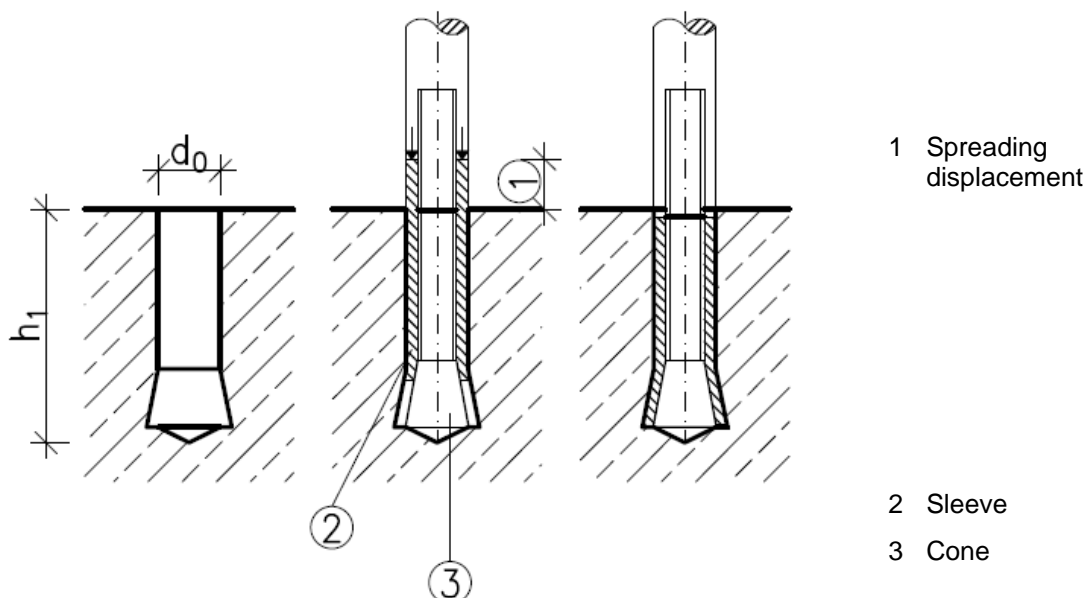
Fastener installation by hammering the fastener sleeve onto the cone
